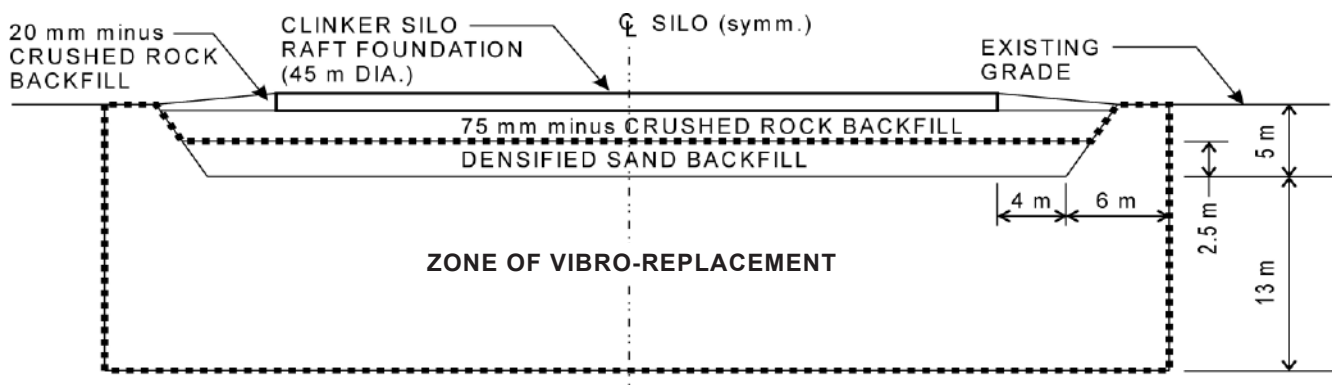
Foundation system: clinker silo – Section Y-Y (see Fig. 6-1 for section location).
